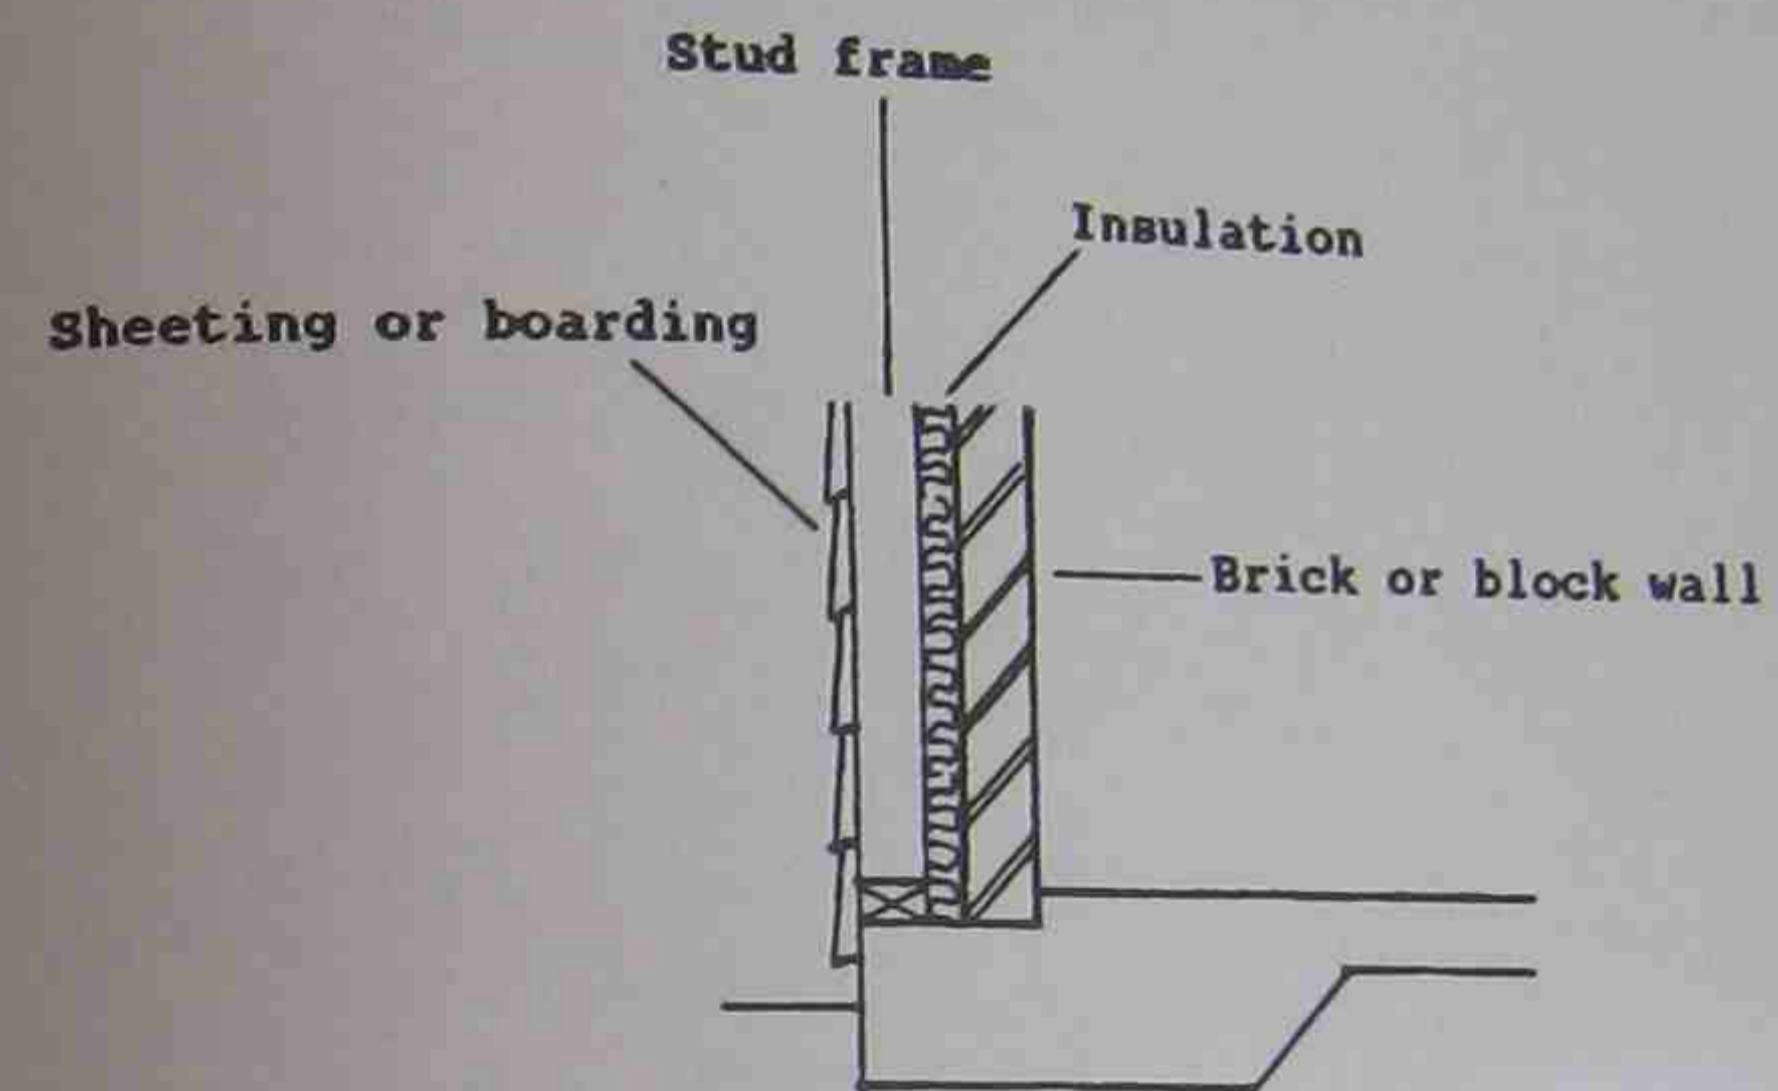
Reverse brick veneer wall based on a stud frame. (After Szokolay, 1991).
